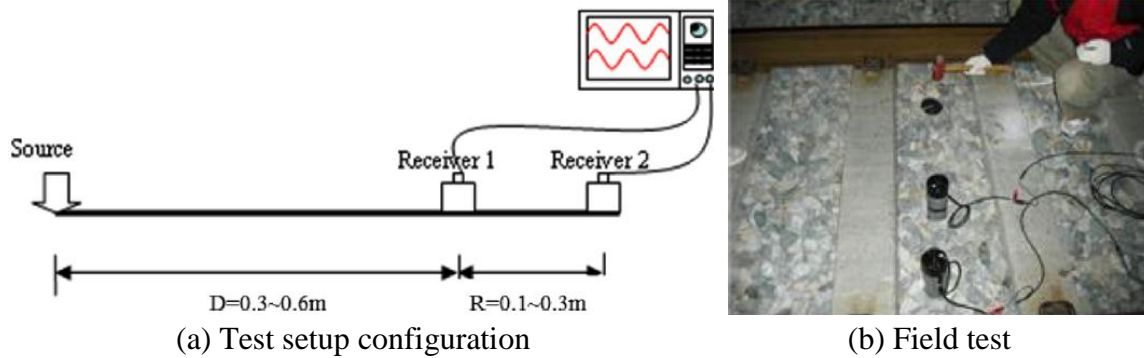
Test setup for evaluating shear wave velocity profile of ballast layer: (a) Range of test setup configurations for Bridge Site 1(Ca#1) and Bridge Site 2 (Ba#1) (b) Field test between the concrete sleepers (Hwang and Park, 2014).
